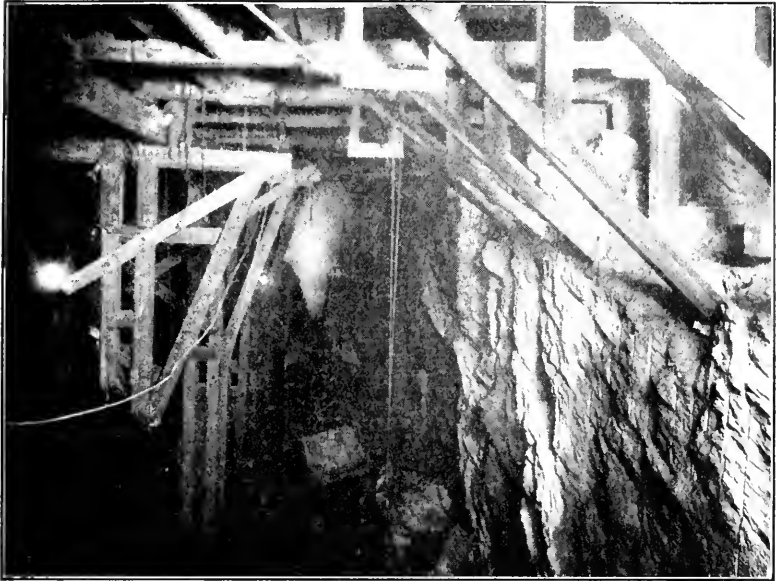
TOWER BENT, BROKEN OFF BY BLAST, SUSPENDED TO BEAMS ABOVE, WHICH ARE CARRYING SAFELY THE LOAD OVER THE EXTRA SPAN BACK TO THE NEXT SUPPORT.
